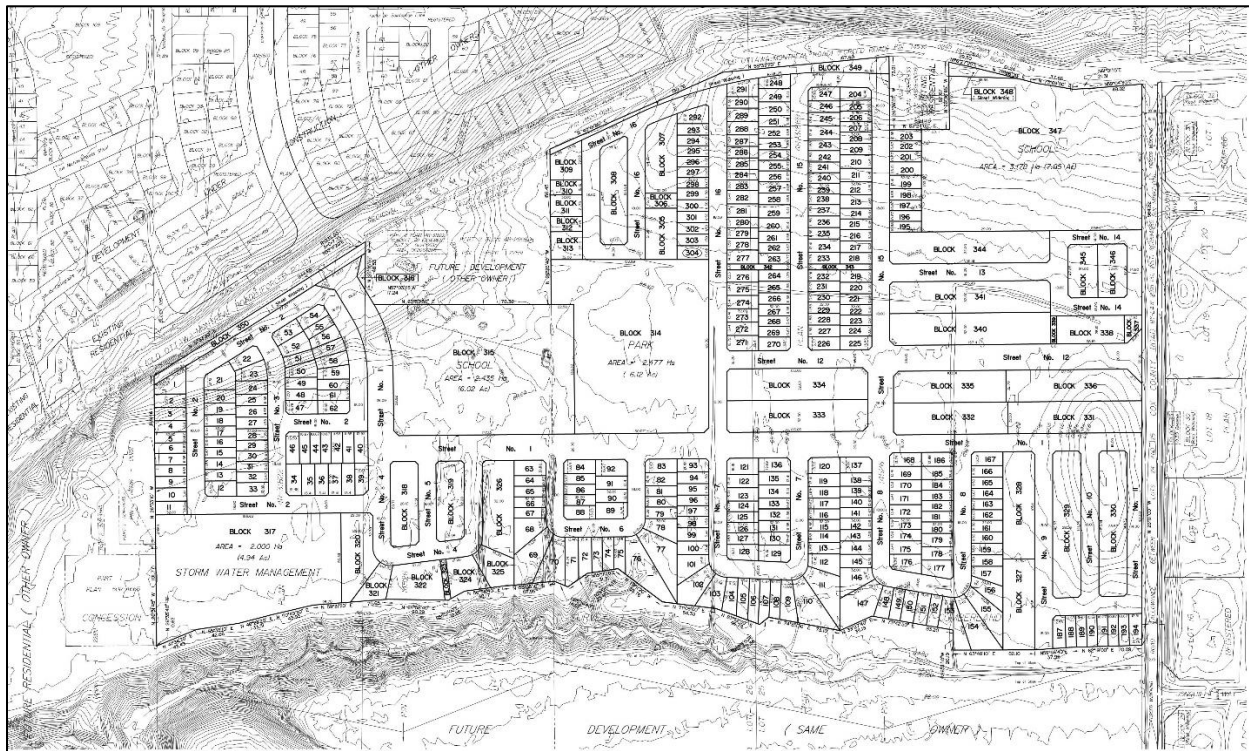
Excerpt from the Draft Plan of Subdivision prepared by Annis O'Sullivan Vollebakk Ltd.
